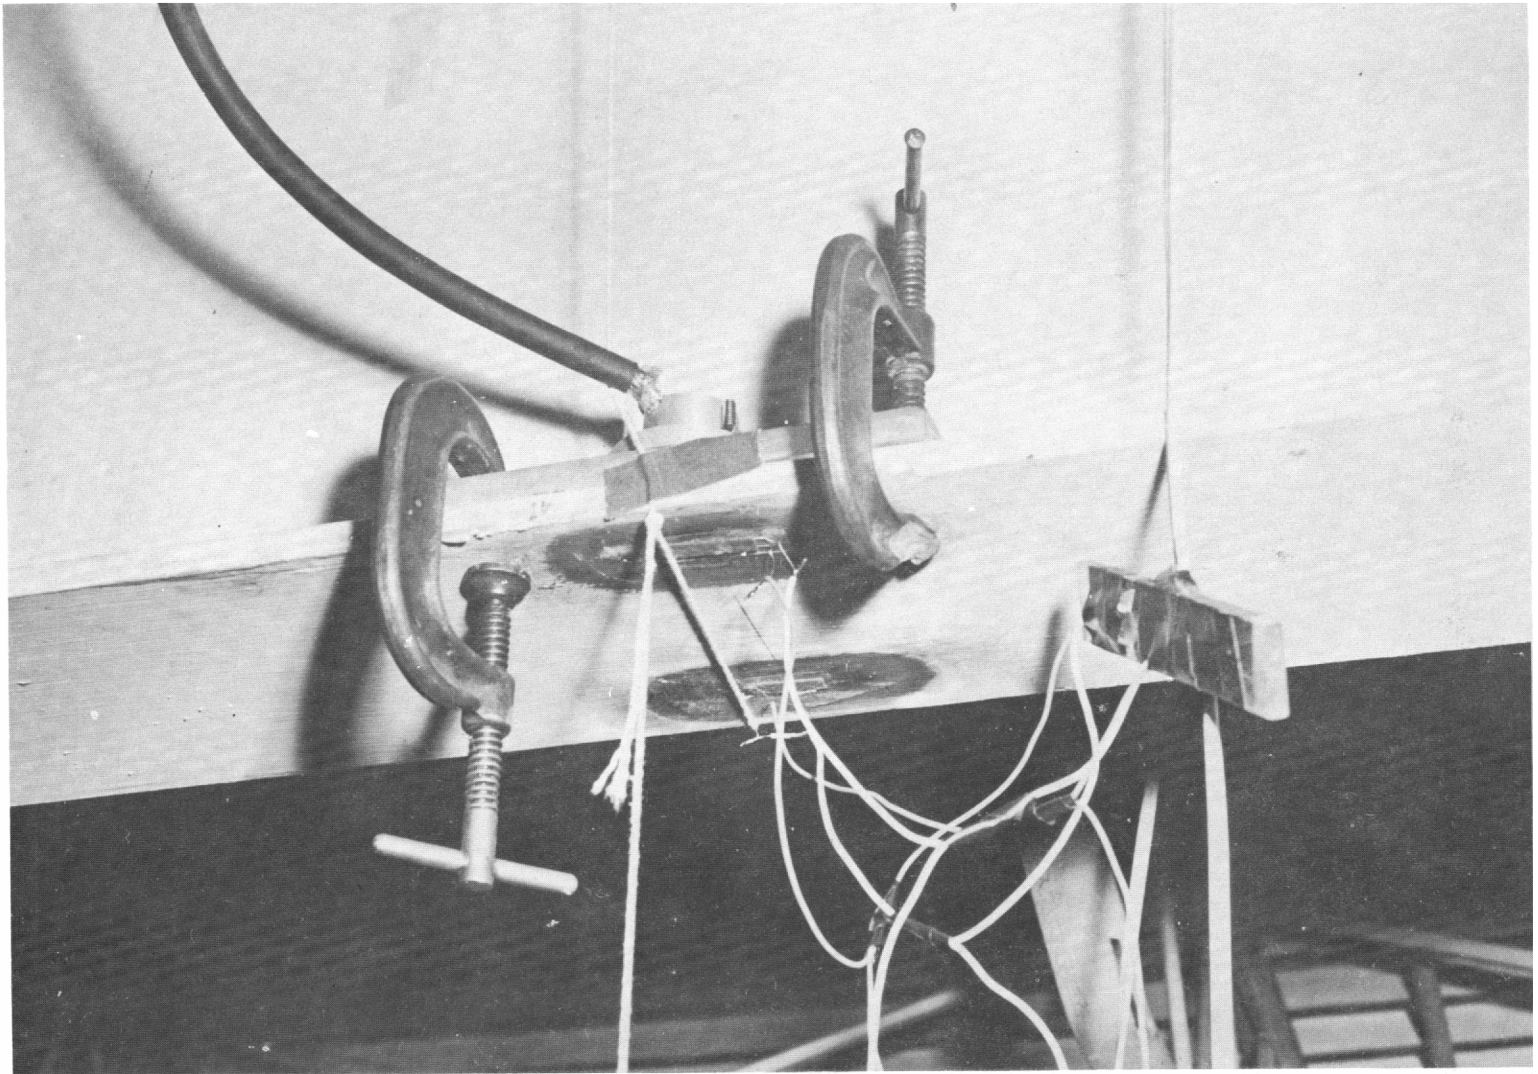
STEEL BEAM GAGE MOUNTINGS
